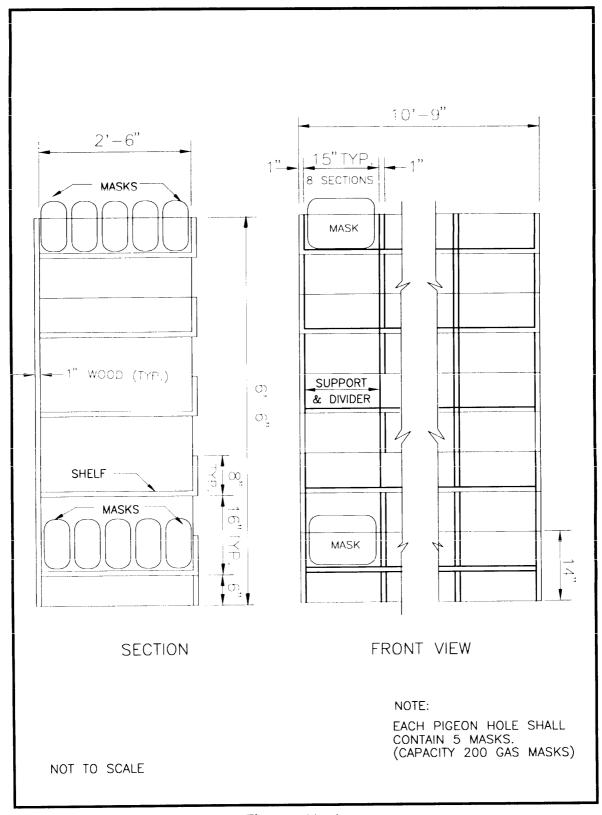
Gas Chamber Gas Mask Wall Storage 216
